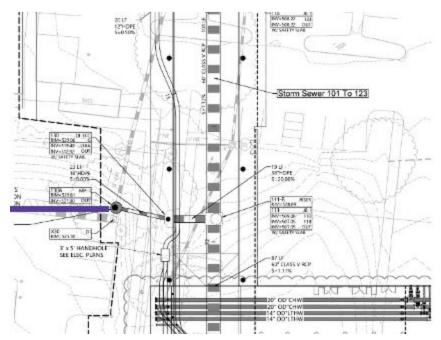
Storm line connection to existing doghouse manhole in phase I.
